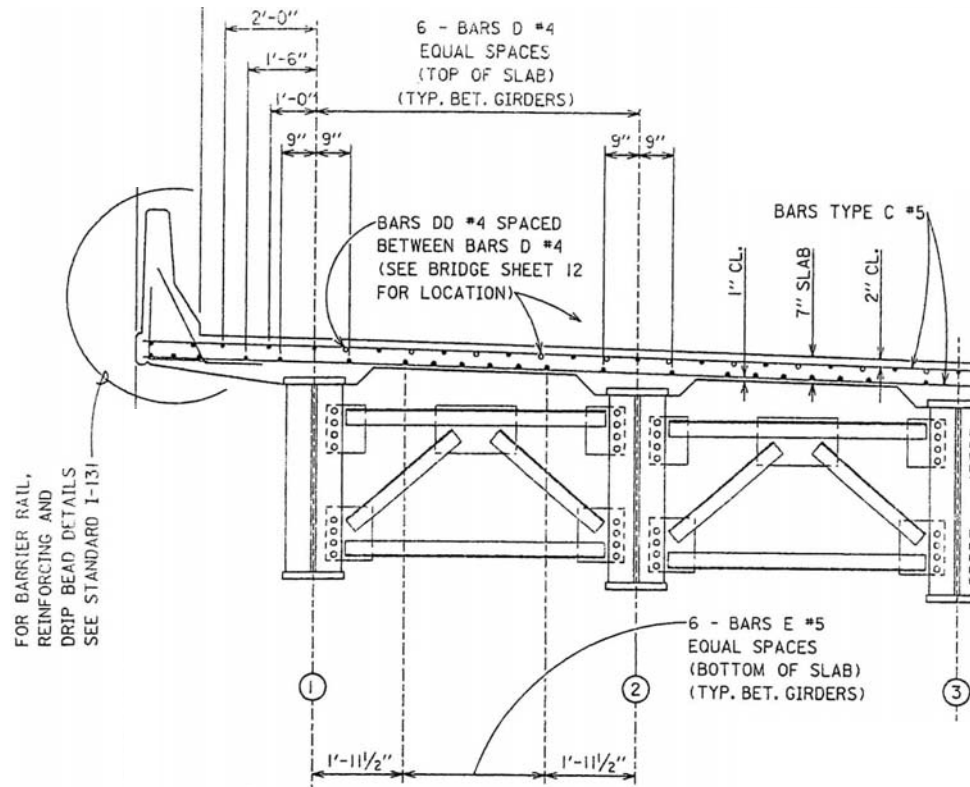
Typical intermediate crossframe diaphragm detail (ALDOT detail)
